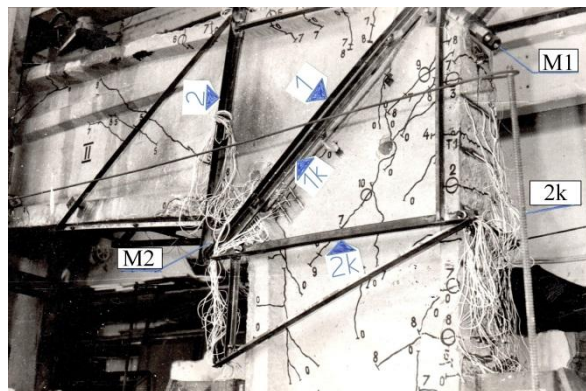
Beam-column joint with struts. Flexibility of the joint is angular deflection 2 in relation to 2k
